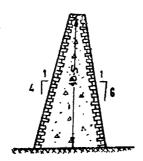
Typical cross-section of masonry weir from Dhule district (Ref. 12).
